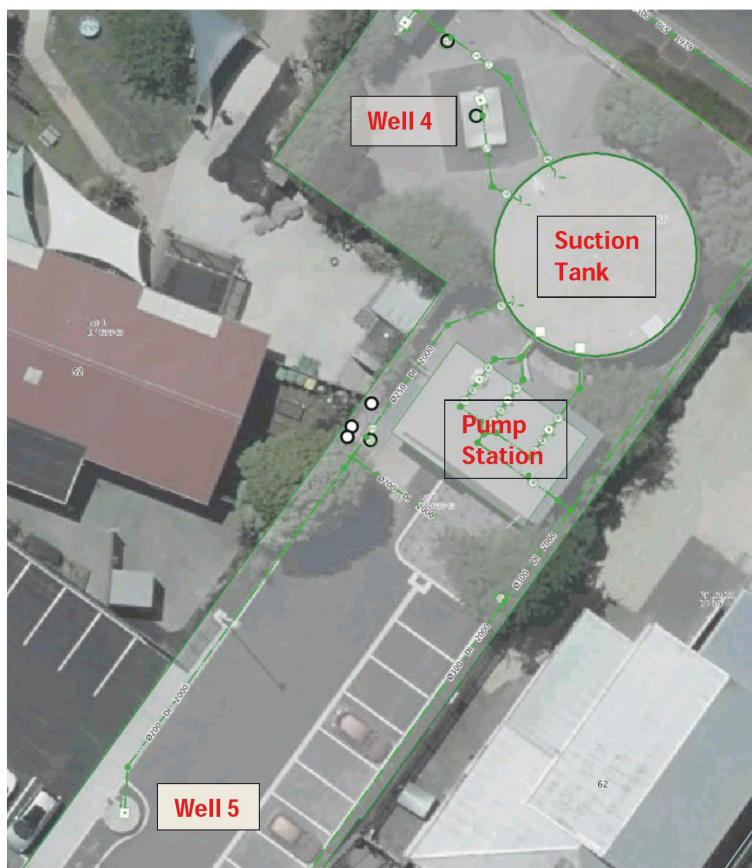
Woolston Pump Station. Well 4 & Well 5 will be upgraded.
